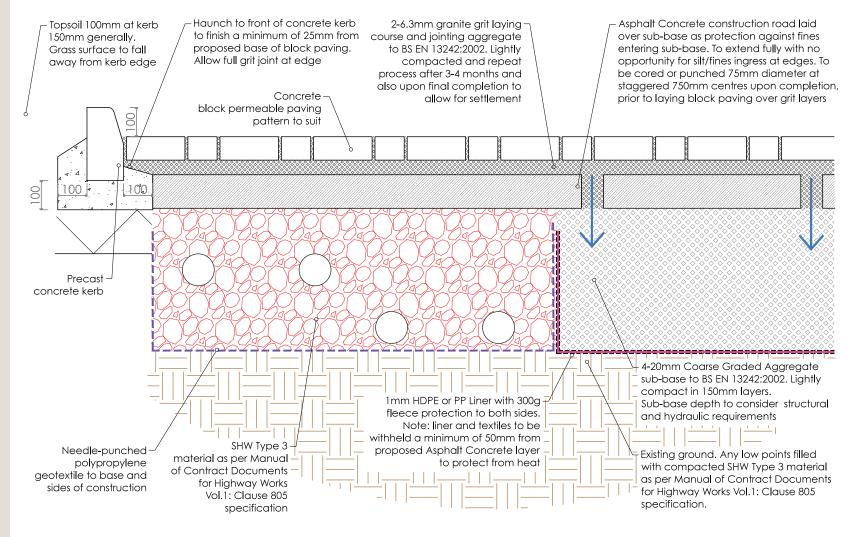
Infiltrating Permeable Paving (System A) - Edge Detail Between Infiltrating Permeable Paving and Service Strip, Incorporating Asphalt Concrete
